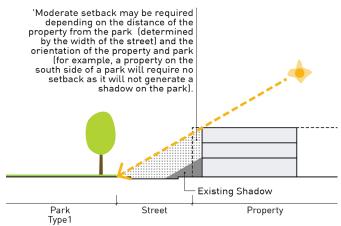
Park Type 1 - Extent of shadow cast by existing building.
